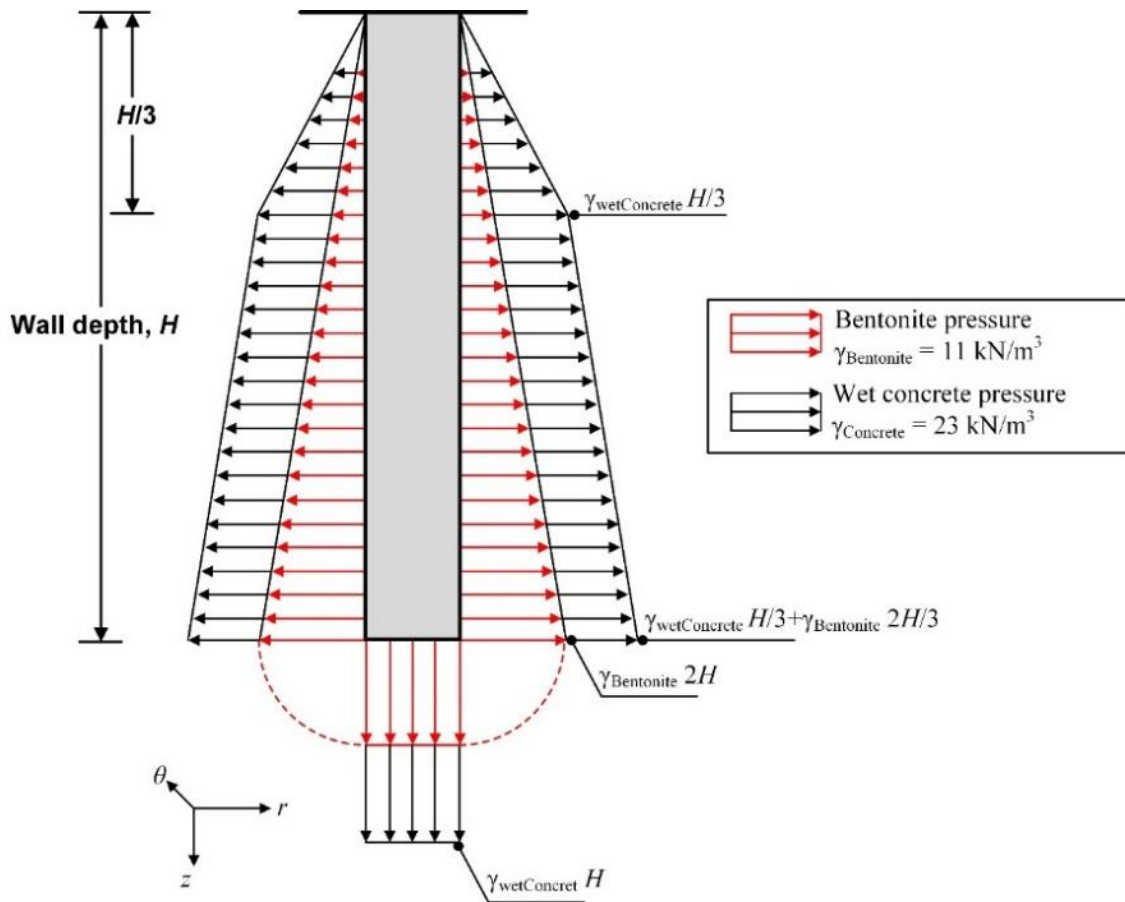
Modelling of wall installation (after Gourvenec & Powrie 1999)
